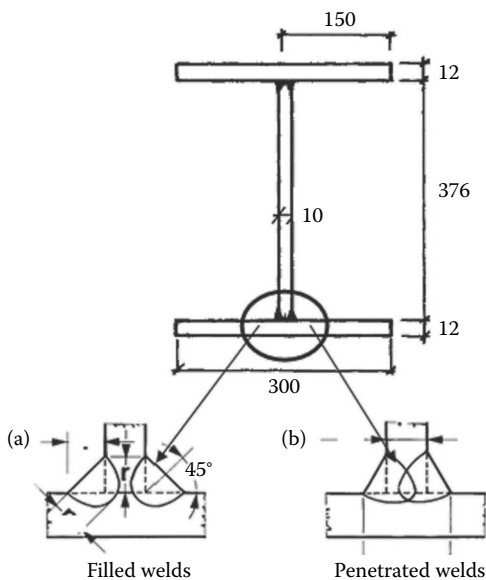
Welded profile types: (a) Filled welds; (b) penetrated welds.
